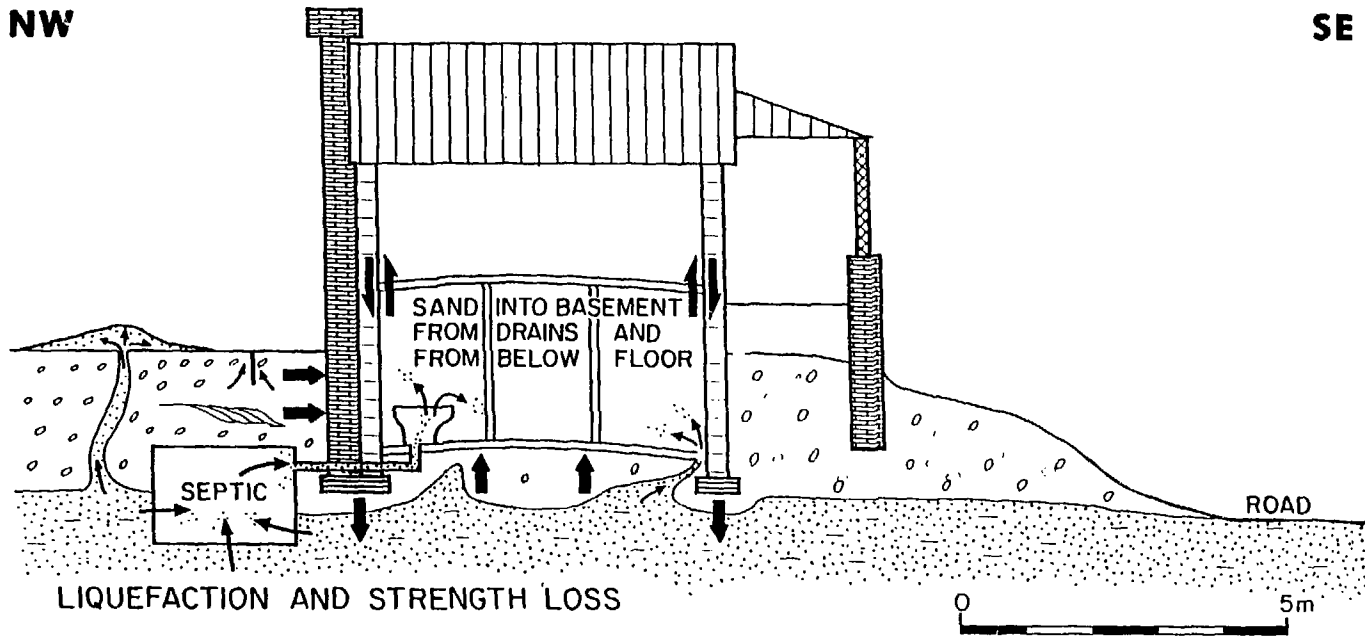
Sketch of damage caused by liquefaction to a house at Site 1 in Ferland. The floors buckled upward and the interior walls were sheared upward relative to the outside bearing walls by about 1 cm. Very fine, gray sand and water entered the cellar via the drains and a 1 cm gap that formed between the floor and the foundation. A ground crack and sand boil formed a few meters from the house and a nearby stream was choked with vented sand. Liquefaction of a subsurface layer may have caused lateral spreading and foundering of the house footings. In addition, the cement-block walls cracked in many places, substantially weakening the building. Very similar kinds of damage were observed at the cement-block home at Site 2.
